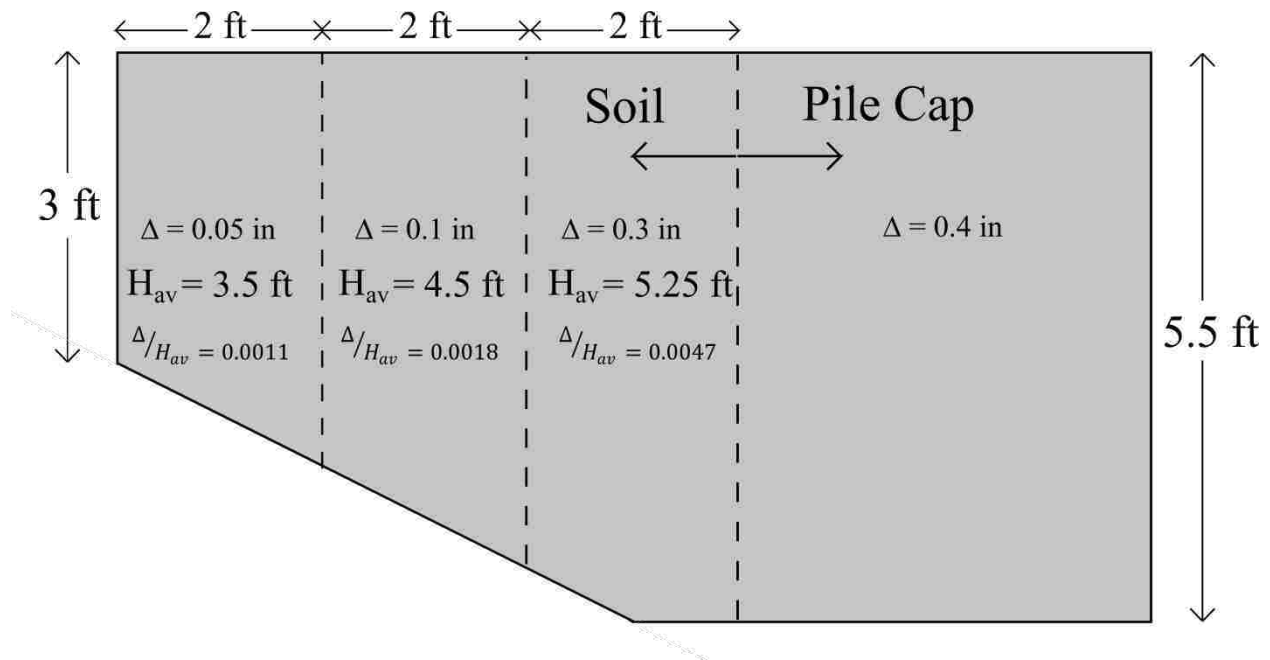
Contact area between soil and wingwall divided into three segments.
